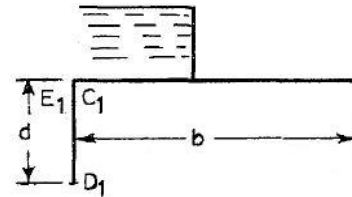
b. A straight horizontal floor having sheet pile on the u/s end
